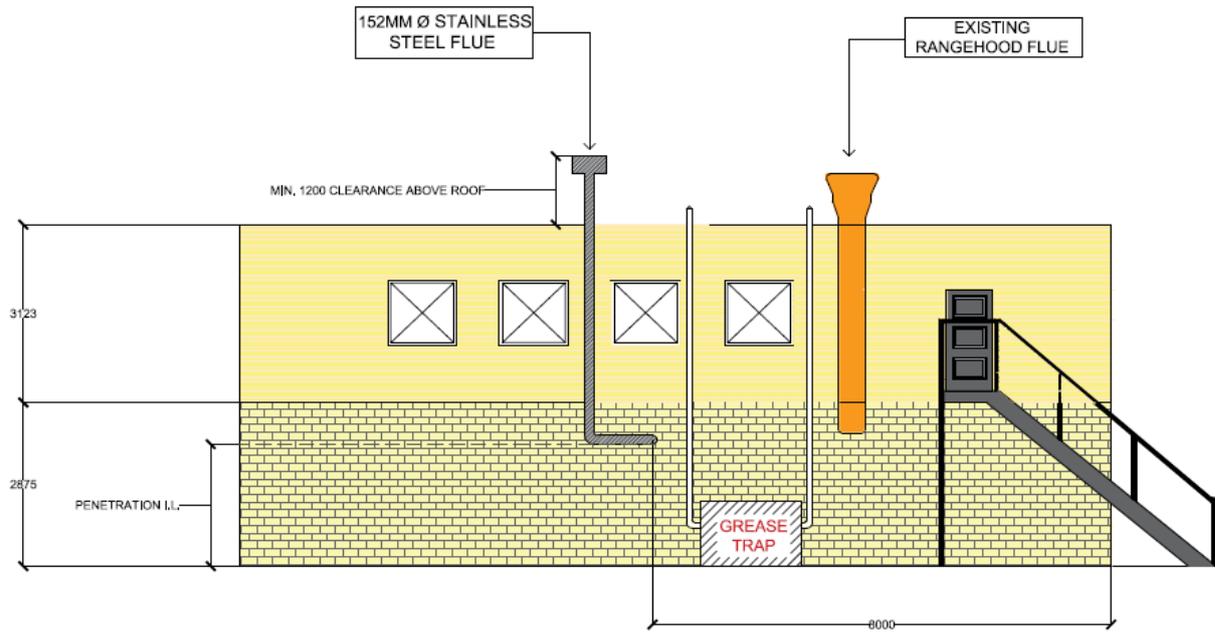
Proposed western elevation. External building facade presenting to side passageway.
